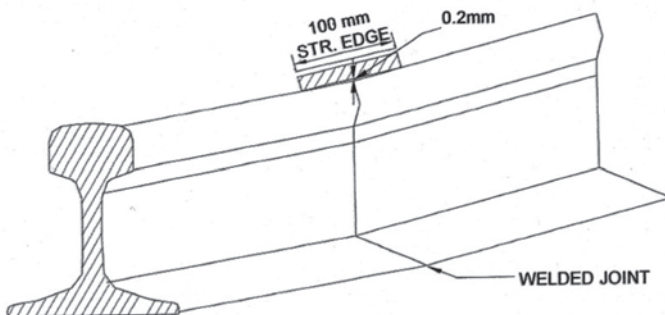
(j) Tolerance for Finishing Top Table Surface of Welded Joint with Old Rails (Low Joint)
